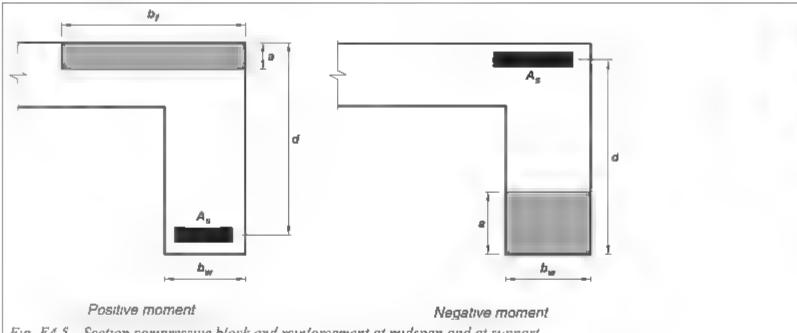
Section compressive block and reinforcement at midspan and at support
